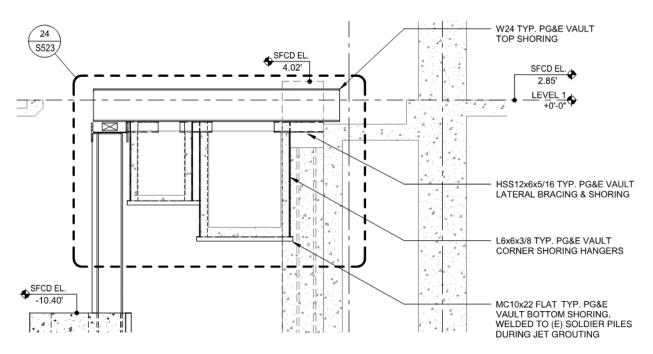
Elevation View of PG&E Vaults and Support Framing
